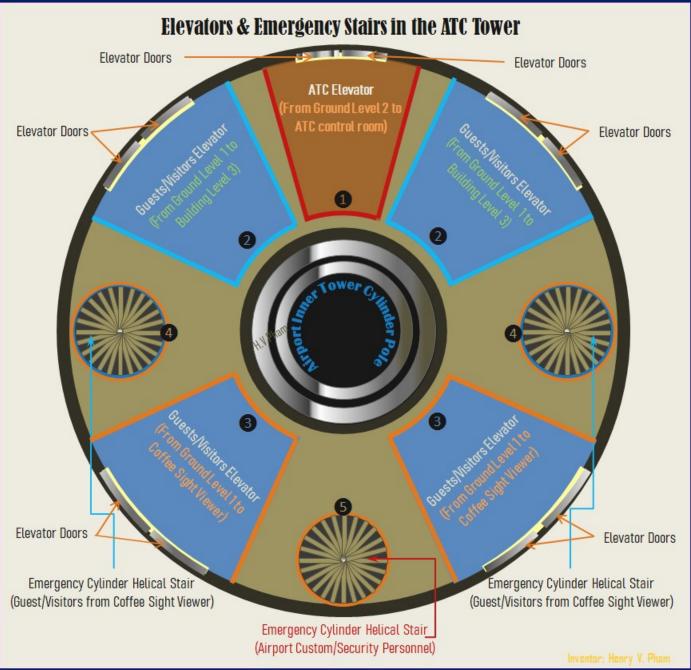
OH SMART AIRPORT - Elevators & Emergency Stairs in ATC Tower Cylinders View
